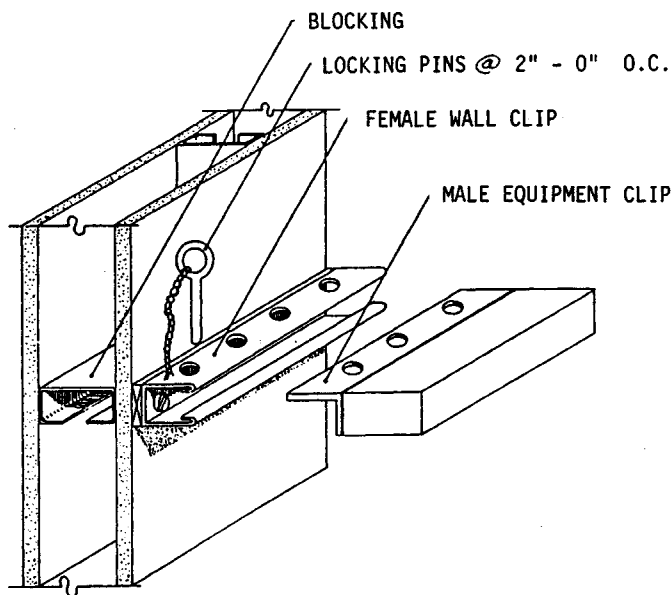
Approaches for Anchoring Equipment on Wheels
